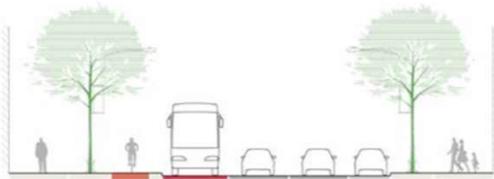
Fifth Street typical section N Lamar Boulevard to Guadalupe Street
